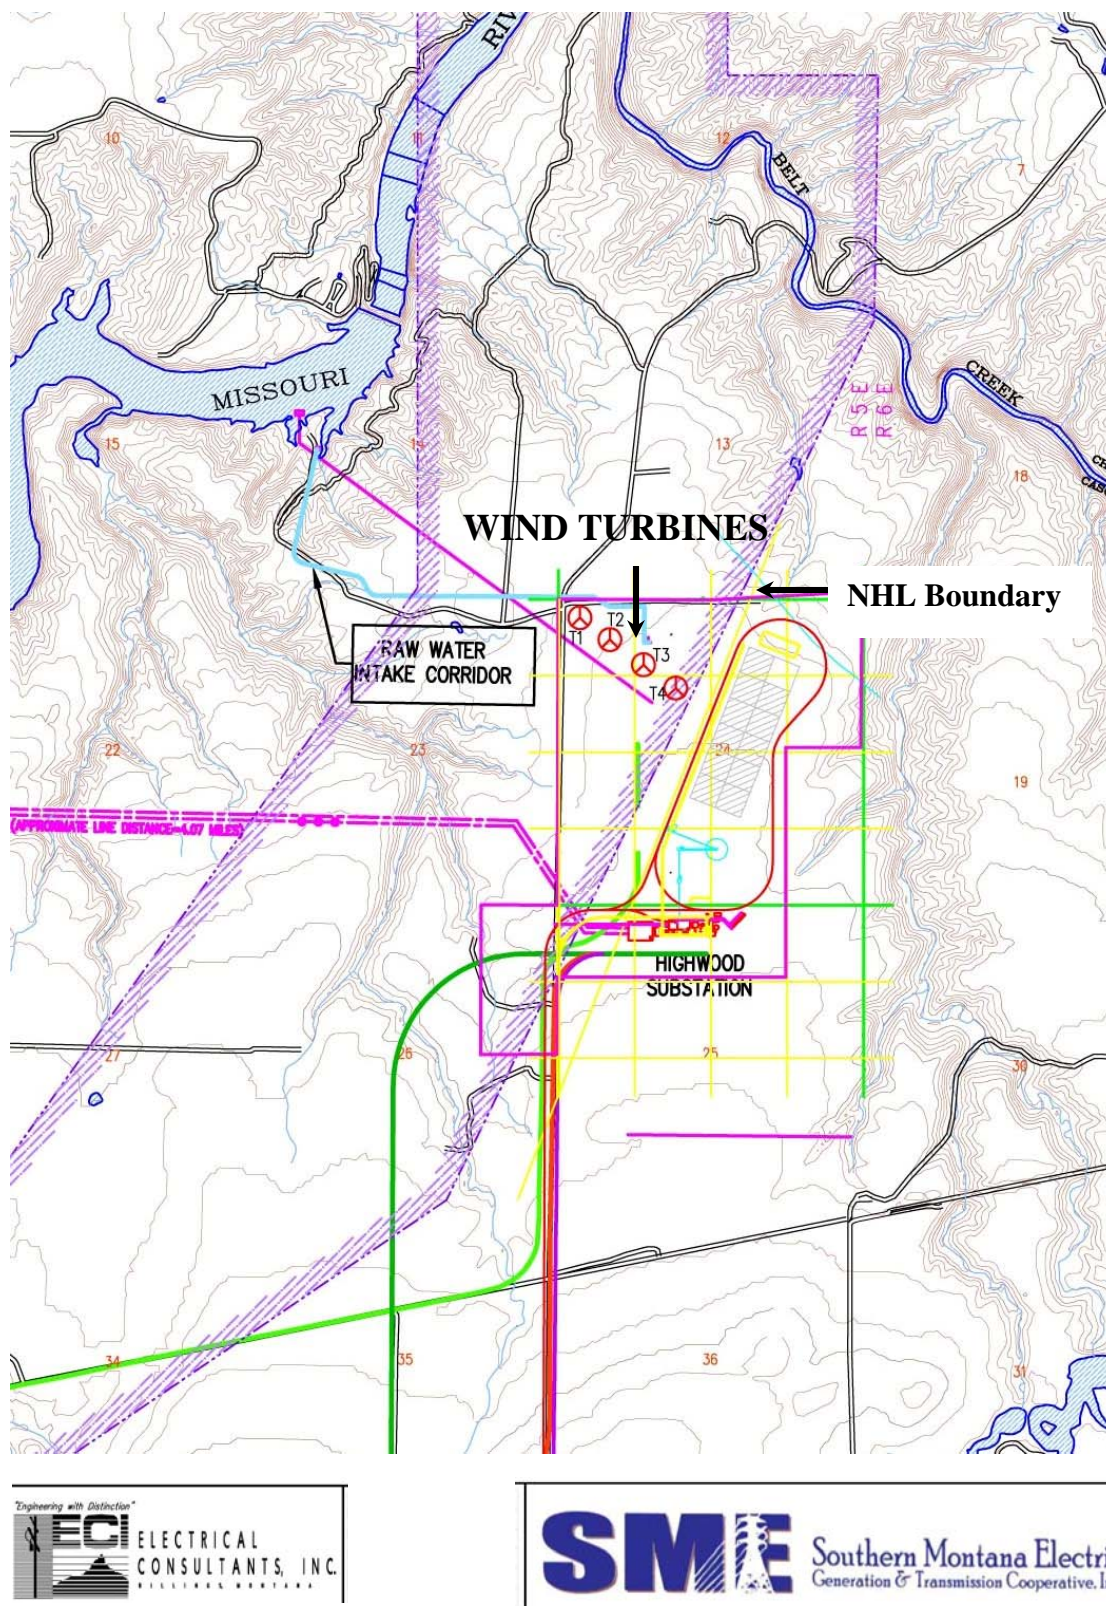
Preliminary HGS Wind Turbine Site Plan
